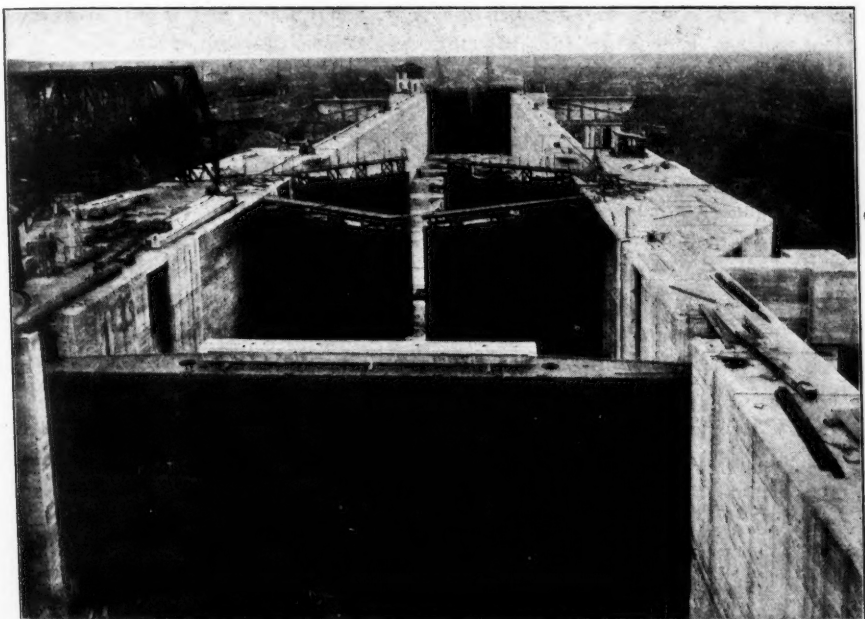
GENERAL VIEW, NEW ORLEANS INNER NAVIGATION CANAL LOCK, WITH EMERGENCY DAM IN FOREGROUND.
